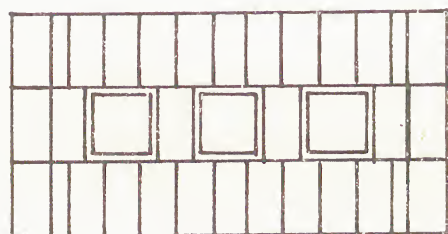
Chimney stack with 9-inch outer walls in English bond.
